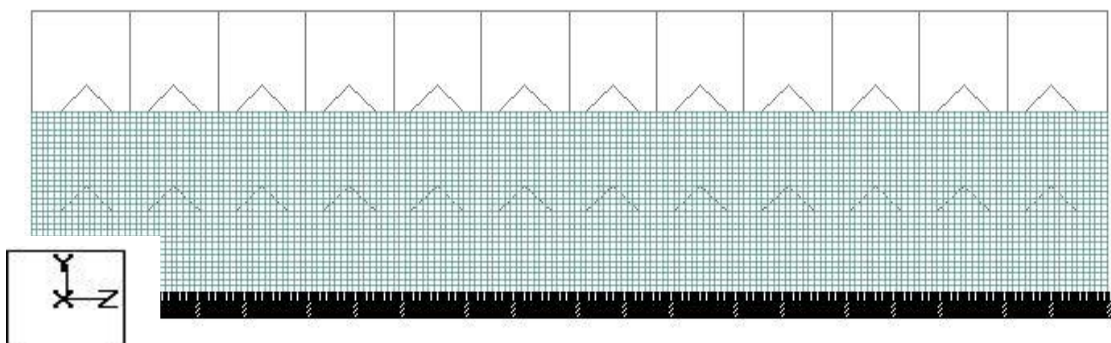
2D View of a Building Structure Model for Looms Industry in Y-Z Plane in STAAD.Pro
